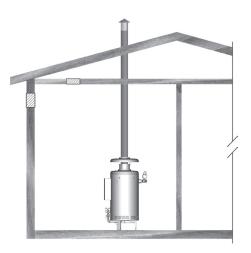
OUTDOOR AIR THROUGH ONE OPENING
